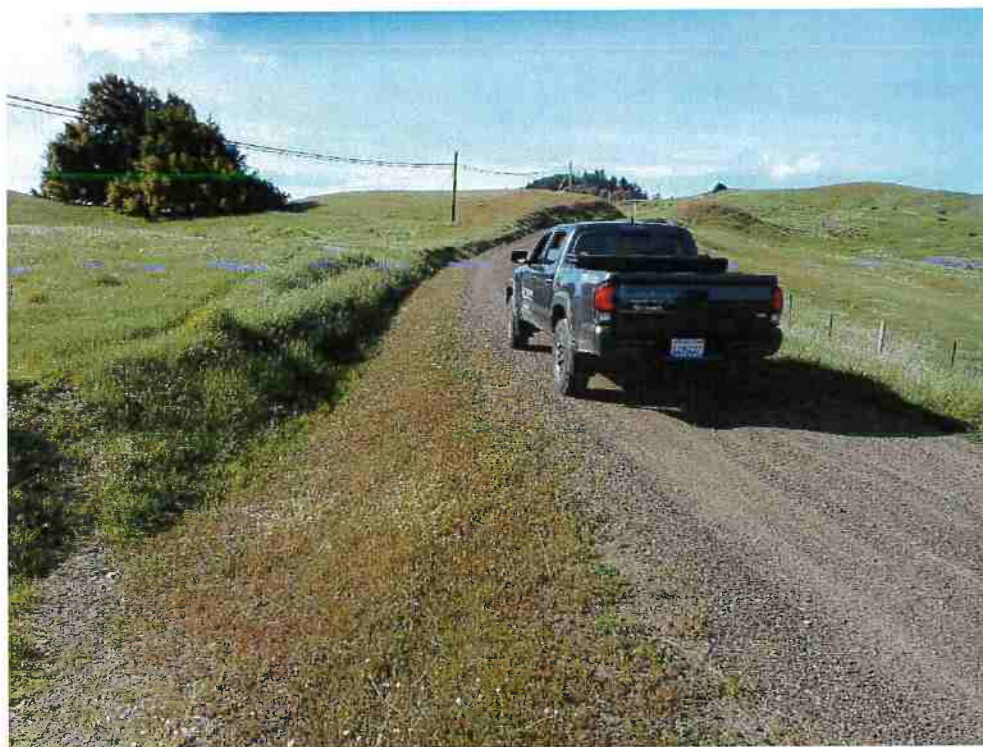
RP 5. Inboard ditch and location of lead-out ditch. Vehicle traveling north. Photo taking facing north.
